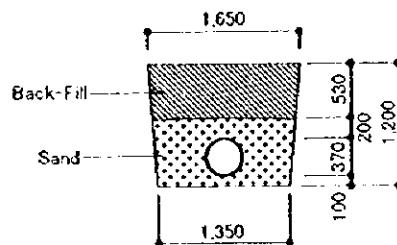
Typical Sectional Plan for the Intake Pipe
